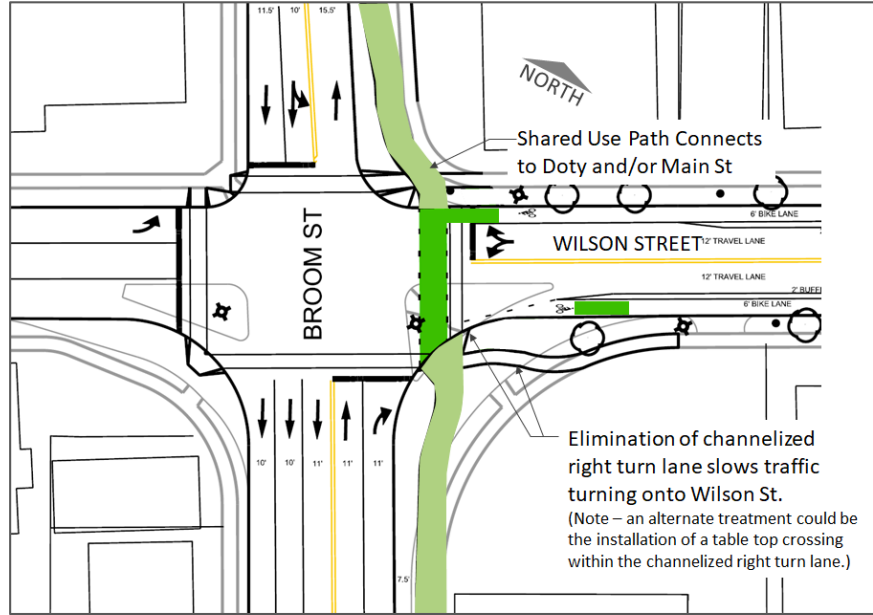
Wilson-Broom Street intersection with shared use path
